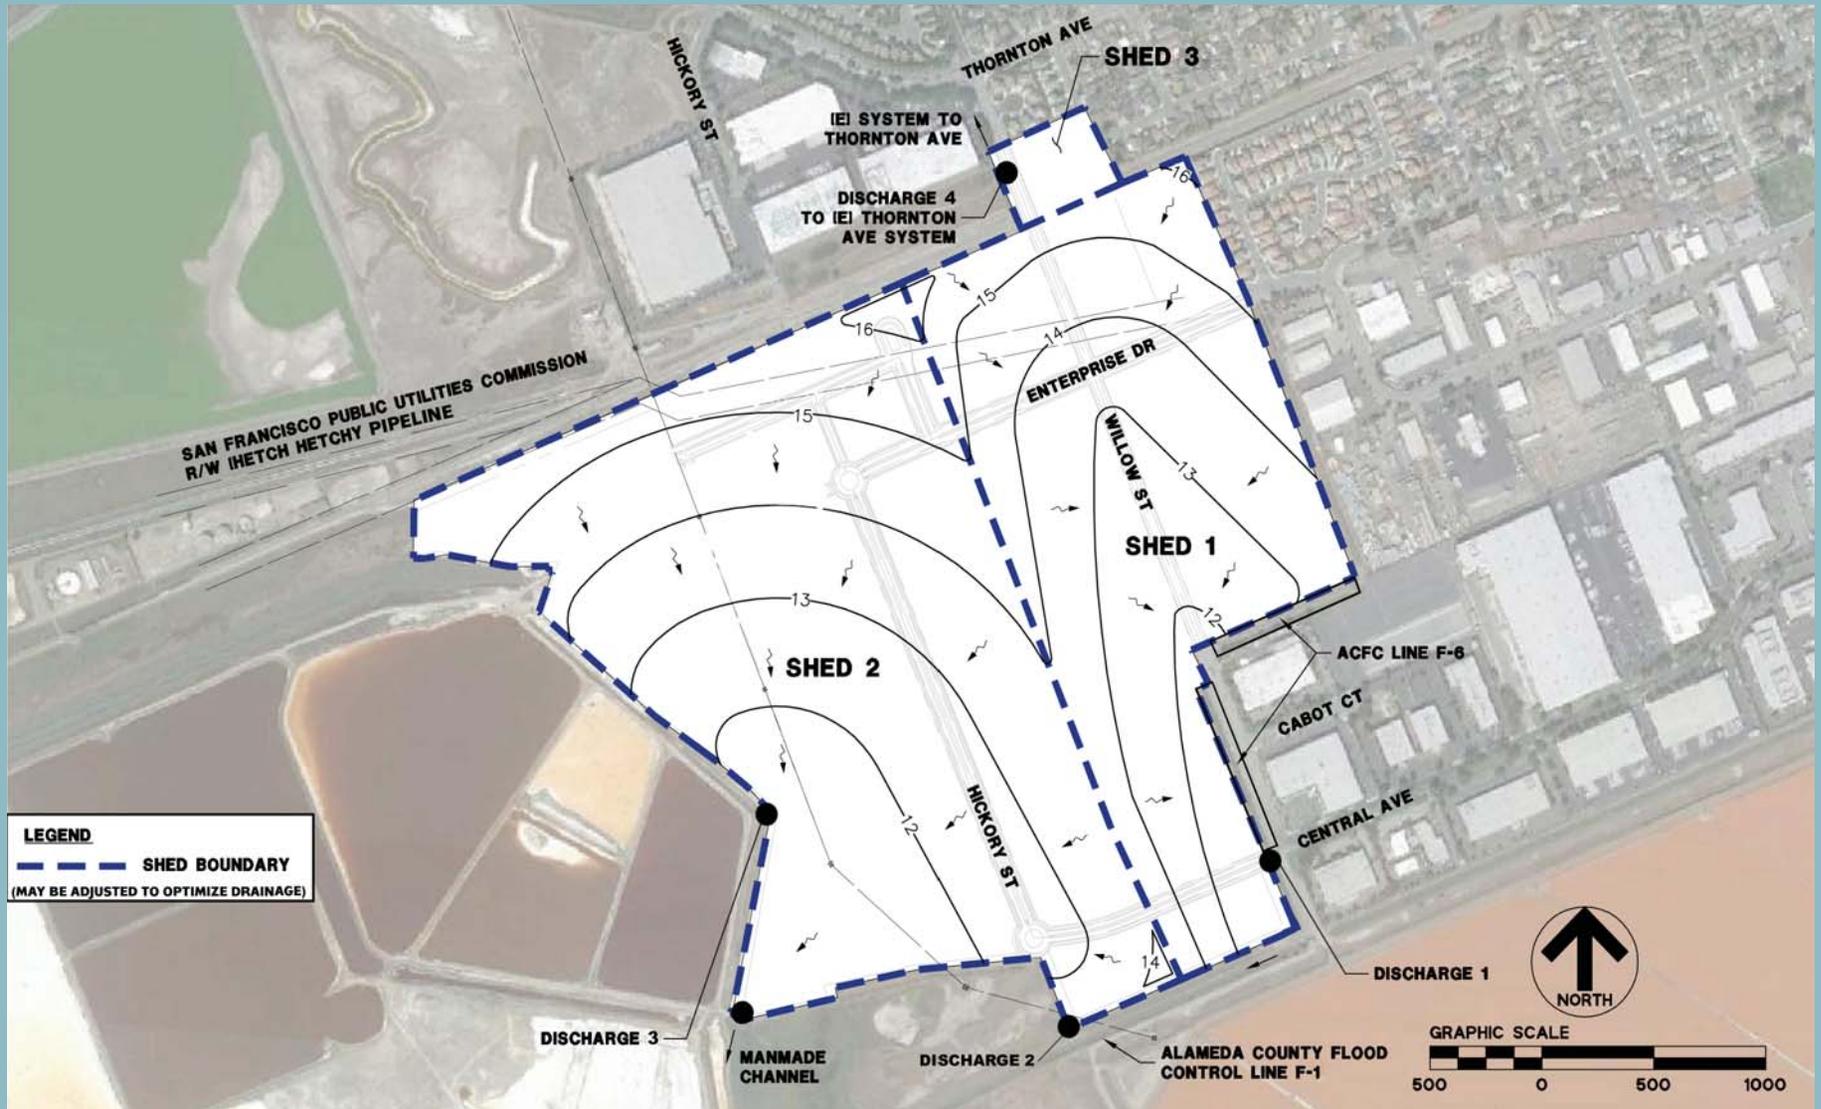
Conceptual Grading / Drainage Plan
